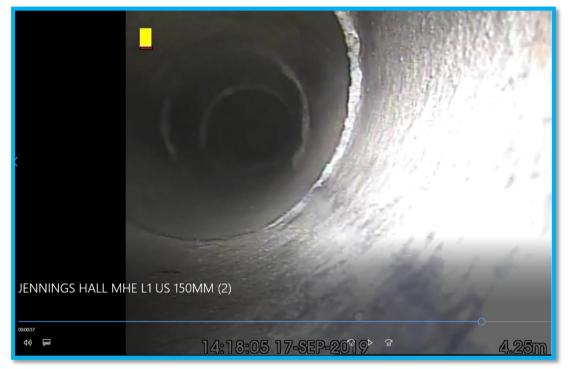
CCTV image of 150mm pipe draining southeastern corner of site (Solum Surveying).
